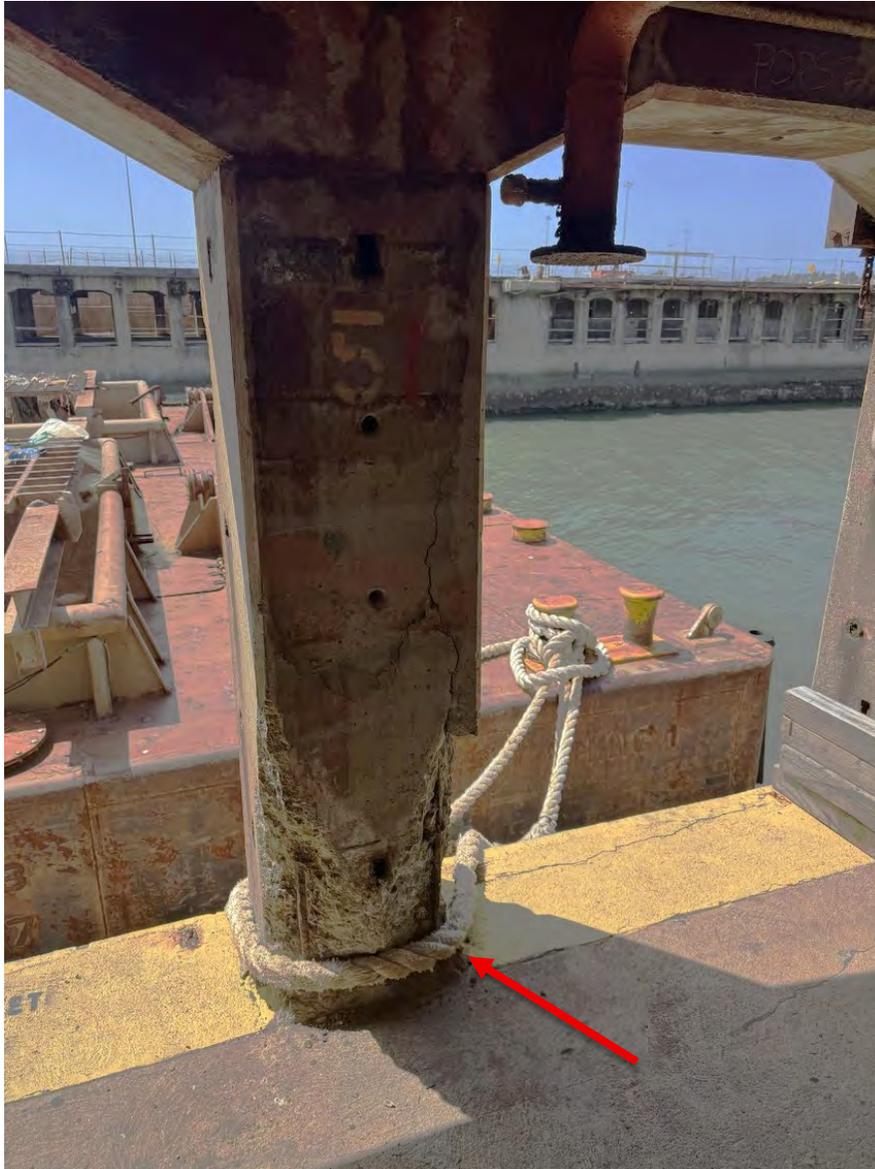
Exterior Columns Used for Mooring, Major to Severe Damage
